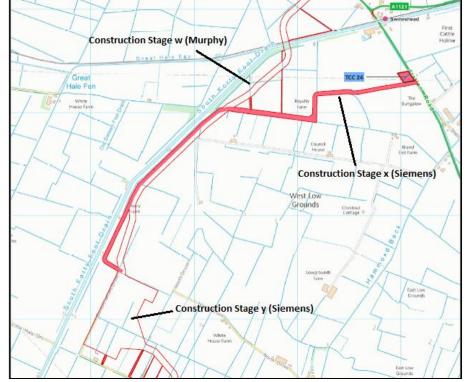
Construction Stages showing overlap between Murphy (Stage w) and Siemens (Stage x)
